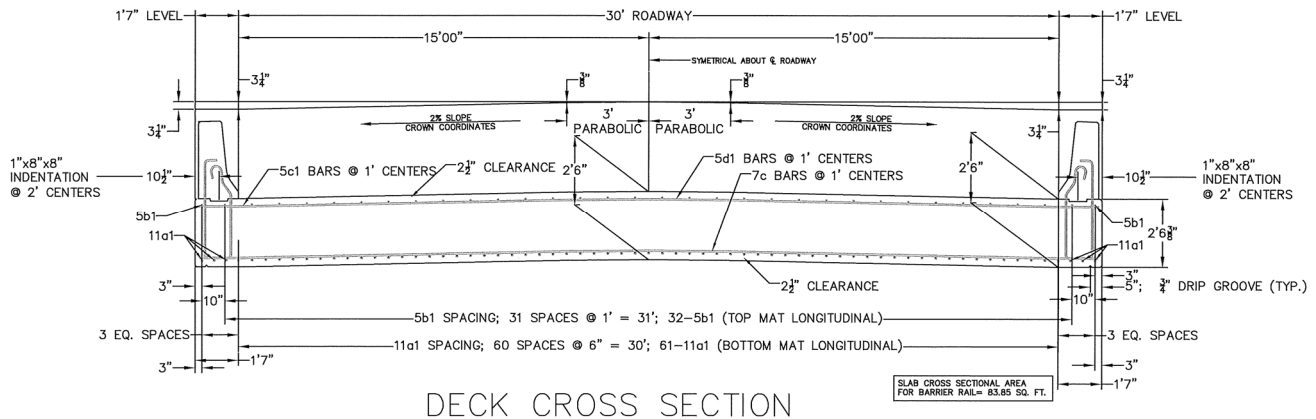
Dubuque County SSCS bridge transverse section (BROS-SWAP-C031(94)—SE-31)
